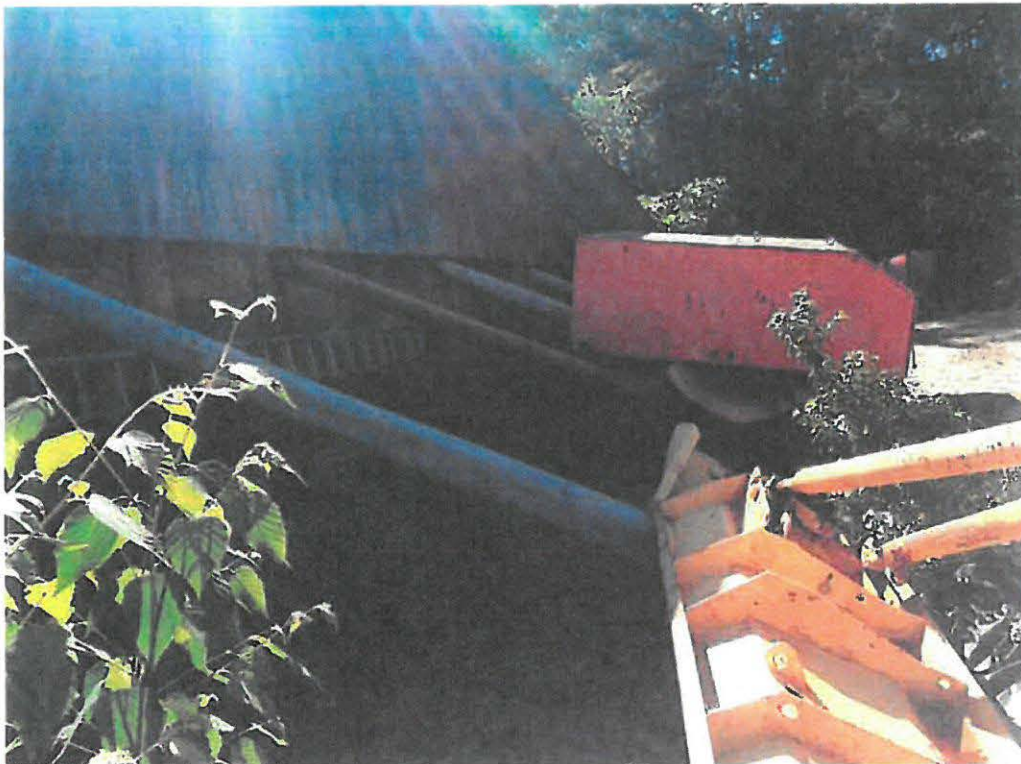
Bristol 206 – Temporary braces holding side and rear walls in place.
